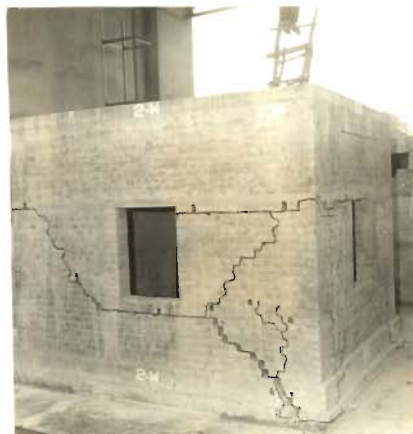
\_ BOTTOM PORTION OF SOUTH - WEST AND SOUTH - EAST CORNERS PUSHED OUTWARDS (MODEL 2)
